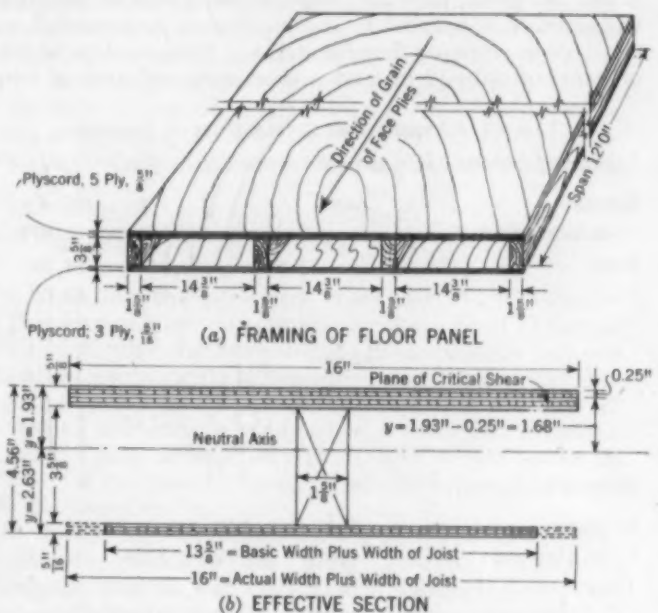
TYPICAL BUILT-UP PLYWOOD FLOOR PANELS
